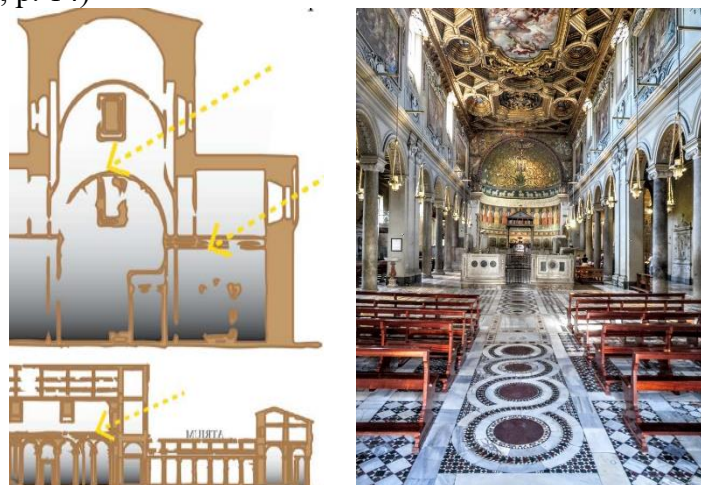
St. Peter Rome A.D. 330 by Constantine with a 5no. aisled loor plan. Light timber trusses reduce bearing on side walls allowing larger openings but height limited by sloped side aisle roof geometry. Windows focus attention towards apse.
